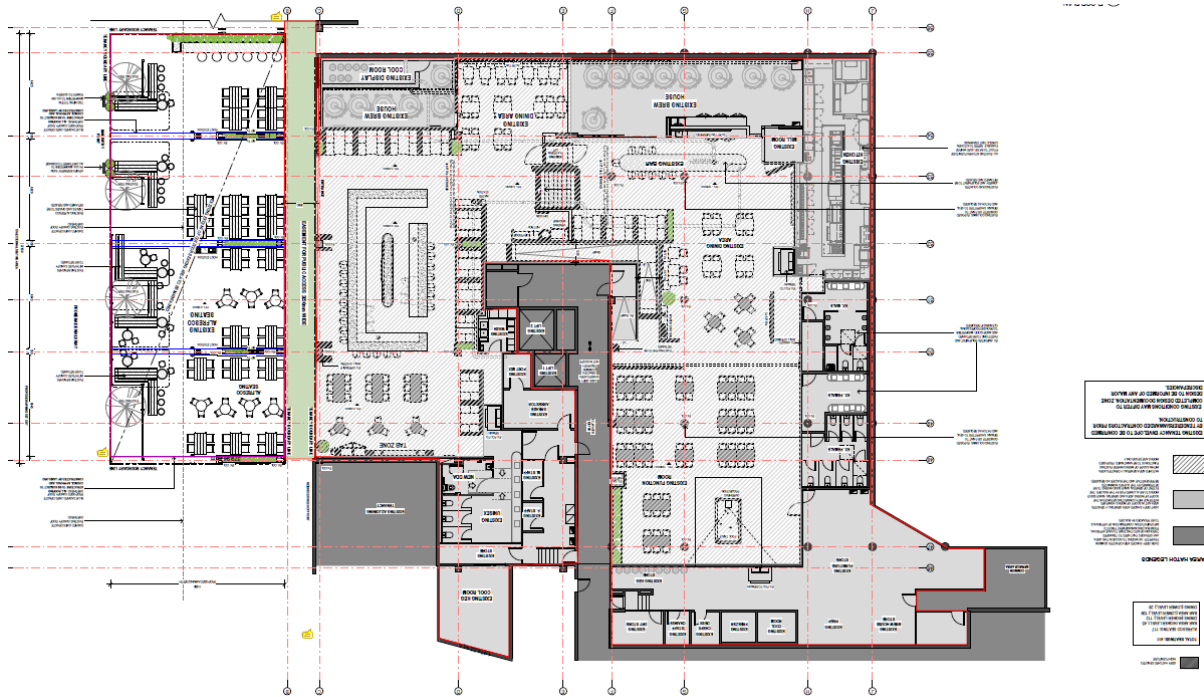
Current floor plan of The Sporting Globe (rotated 180 degrees, so that north is pointing up). The reference to a proposed canopy roof over the outdoor seating area on the plan refers to separate development application D/2021/909 that is concurrently under assessment.
